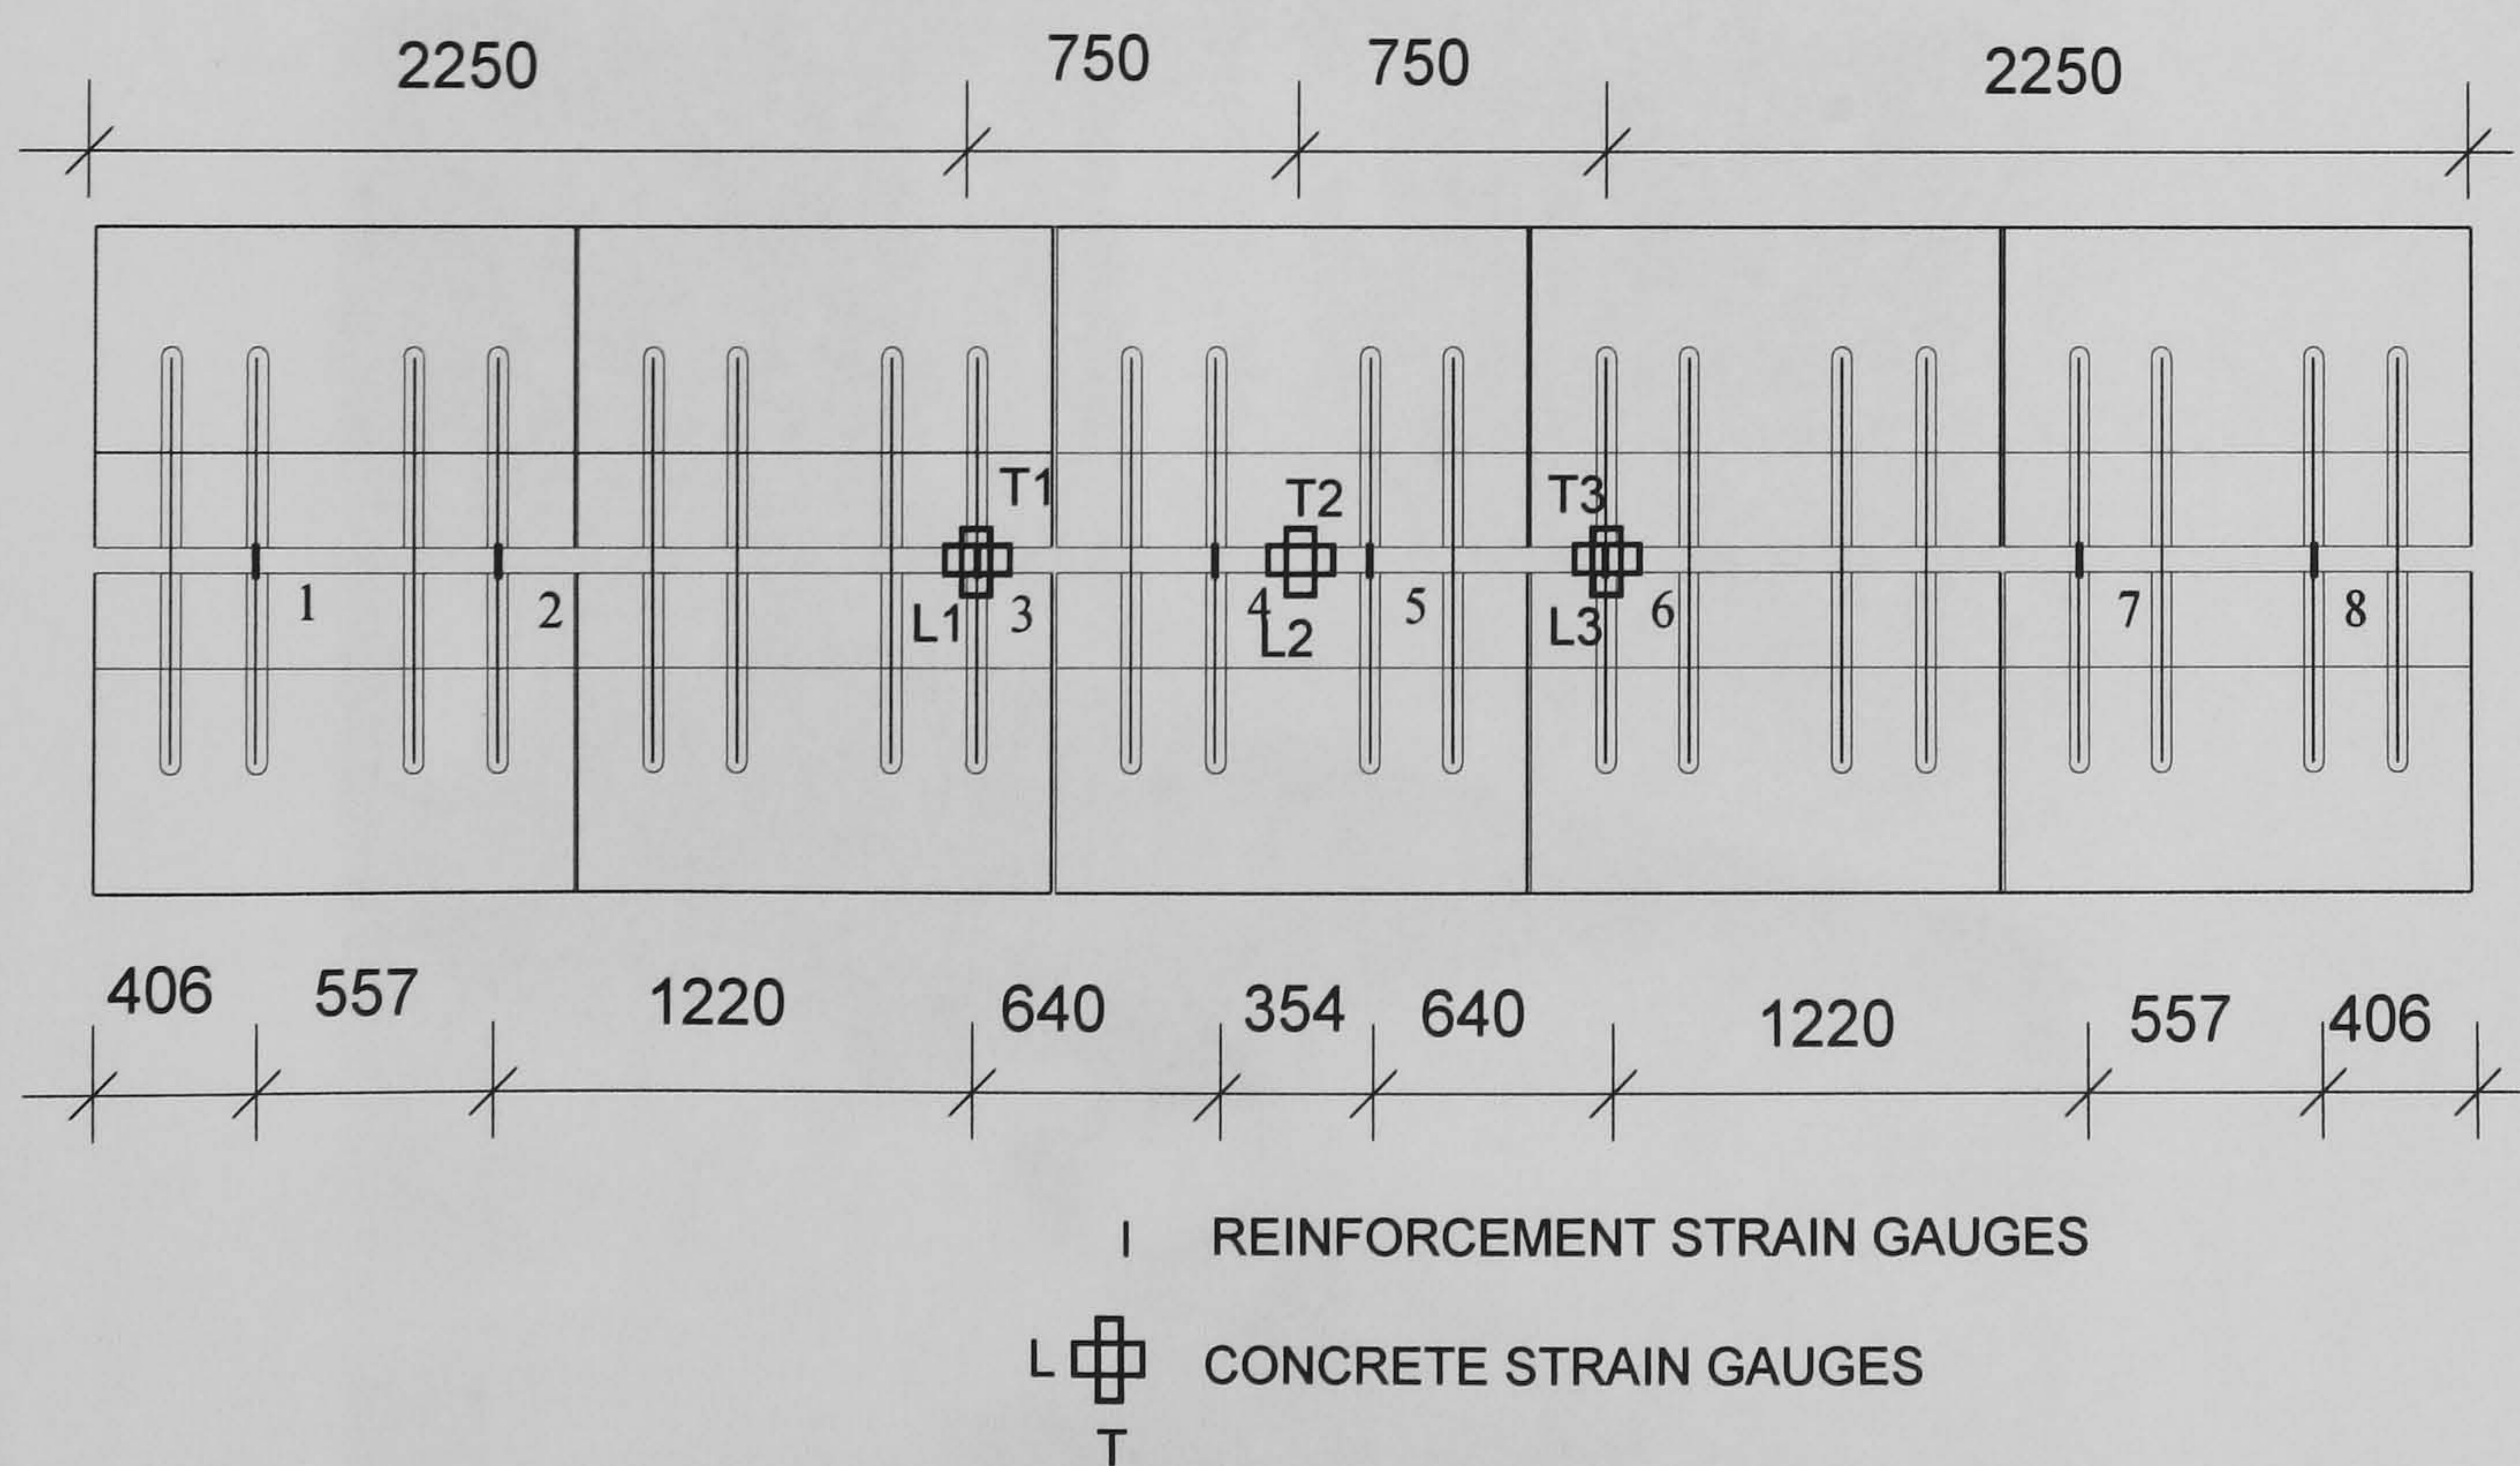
Positions of concrete and transverse reinforcement gauges
